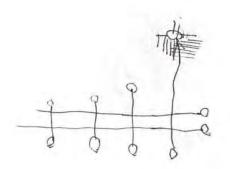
Final sketch plan of the building - after removing the additional portal frame.
